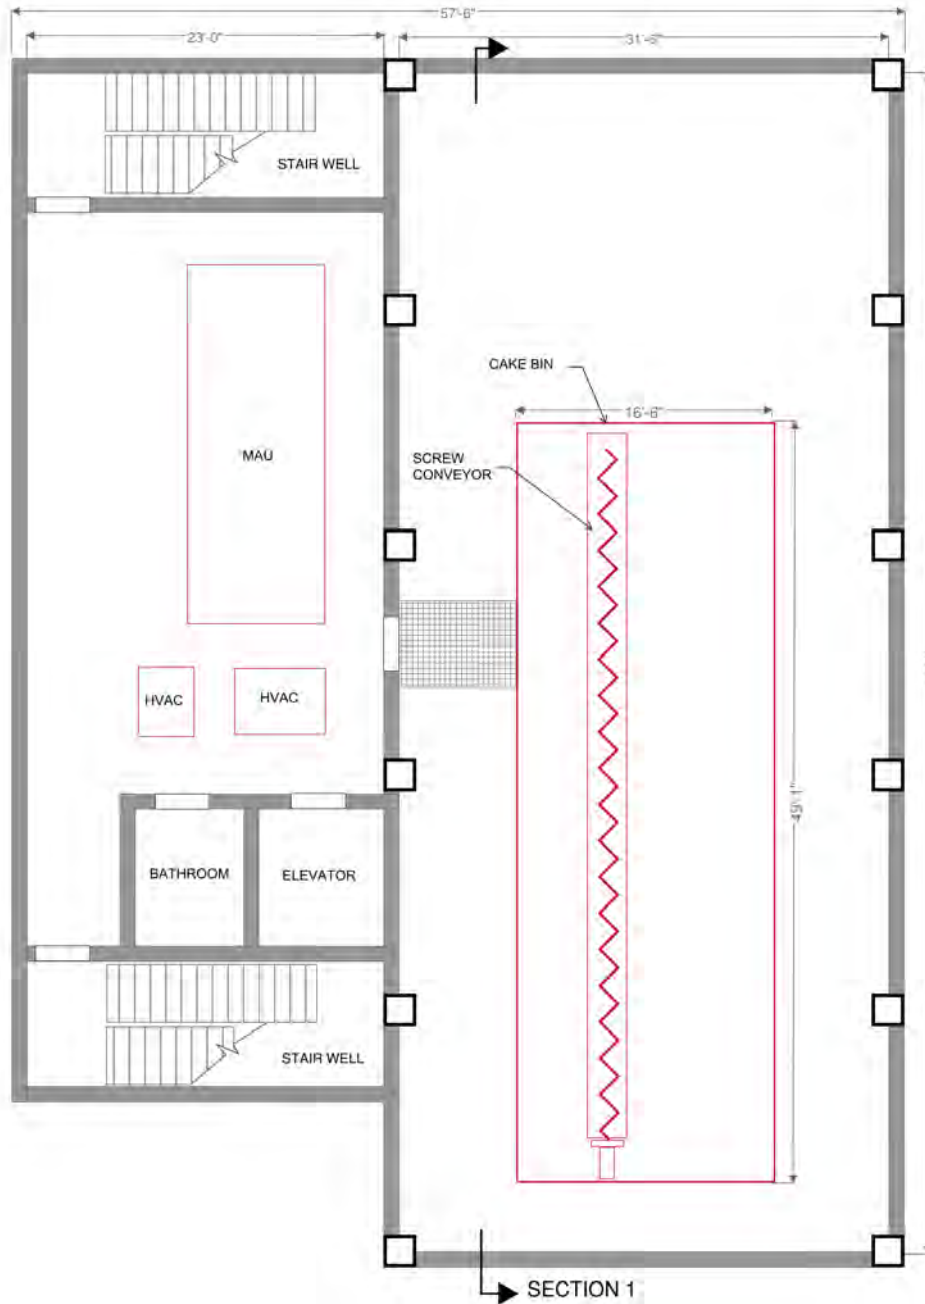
New Final Dewatering Facility Mezzanine Floor Plan
